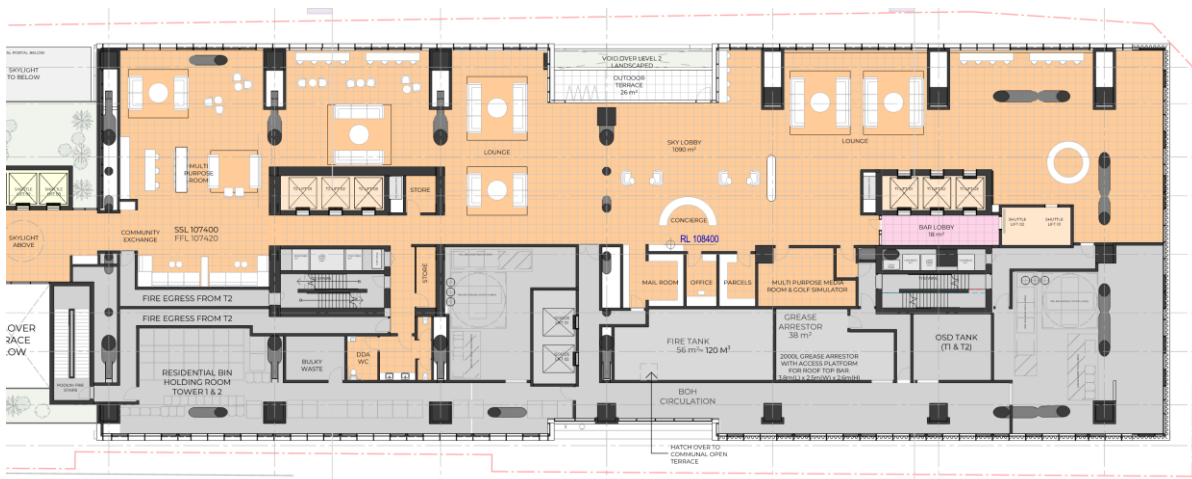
Exert of proposed amendment to Level 3 Plan (Source: Woods Bagot)
